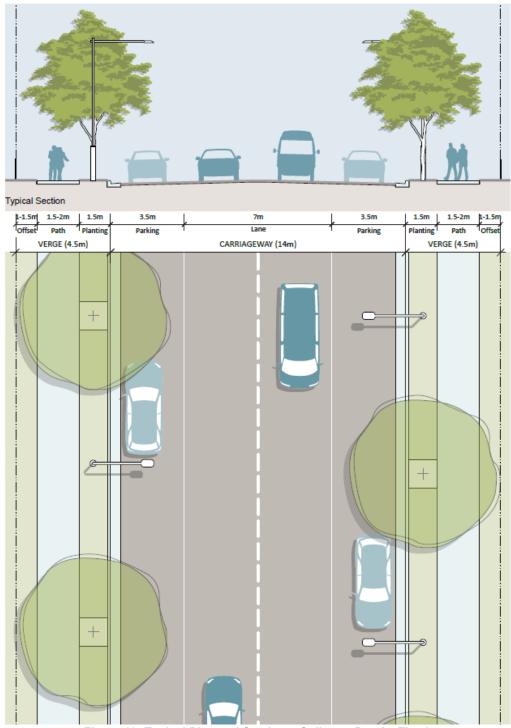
Typical Plan and Section - Collector Road - Tier 1
